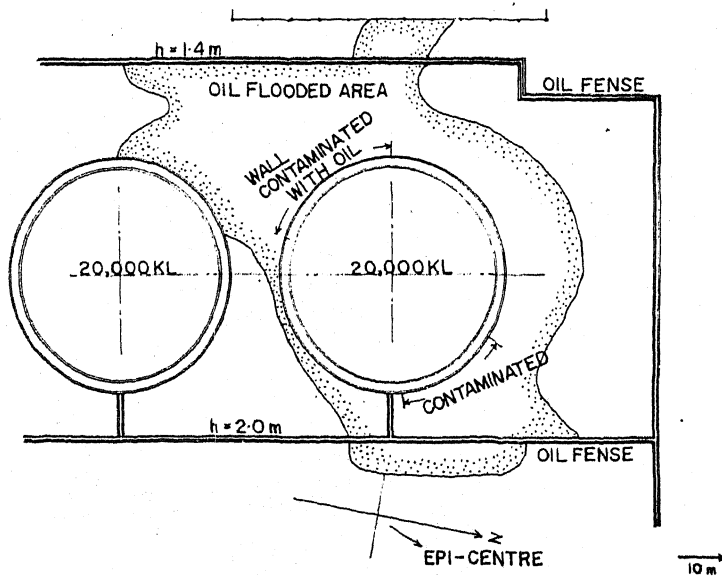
SKETCH OF FLOODED HEAVY OIL AROUND THE FLOATING ROOF TYPE STORAGE (AFTER YAMAMOTO).
